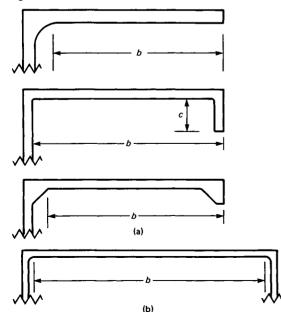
Plate elements as considered for local buckling. (a) Outstand (plain and reinforced): (b) internal element
